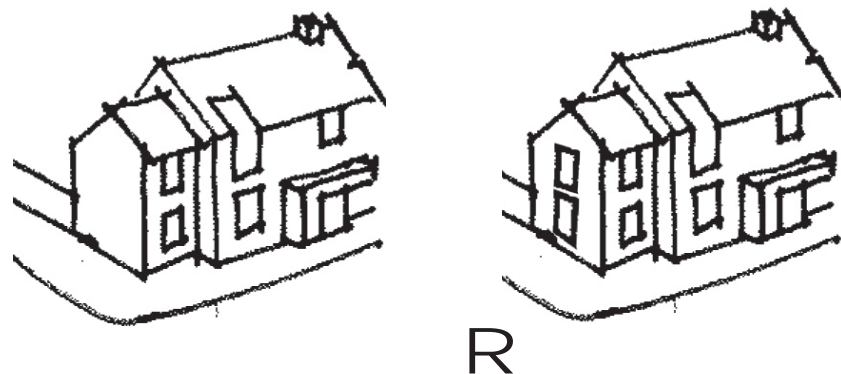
Extensions where side elevations face the street should incorporate windows to provide passive surveillance
